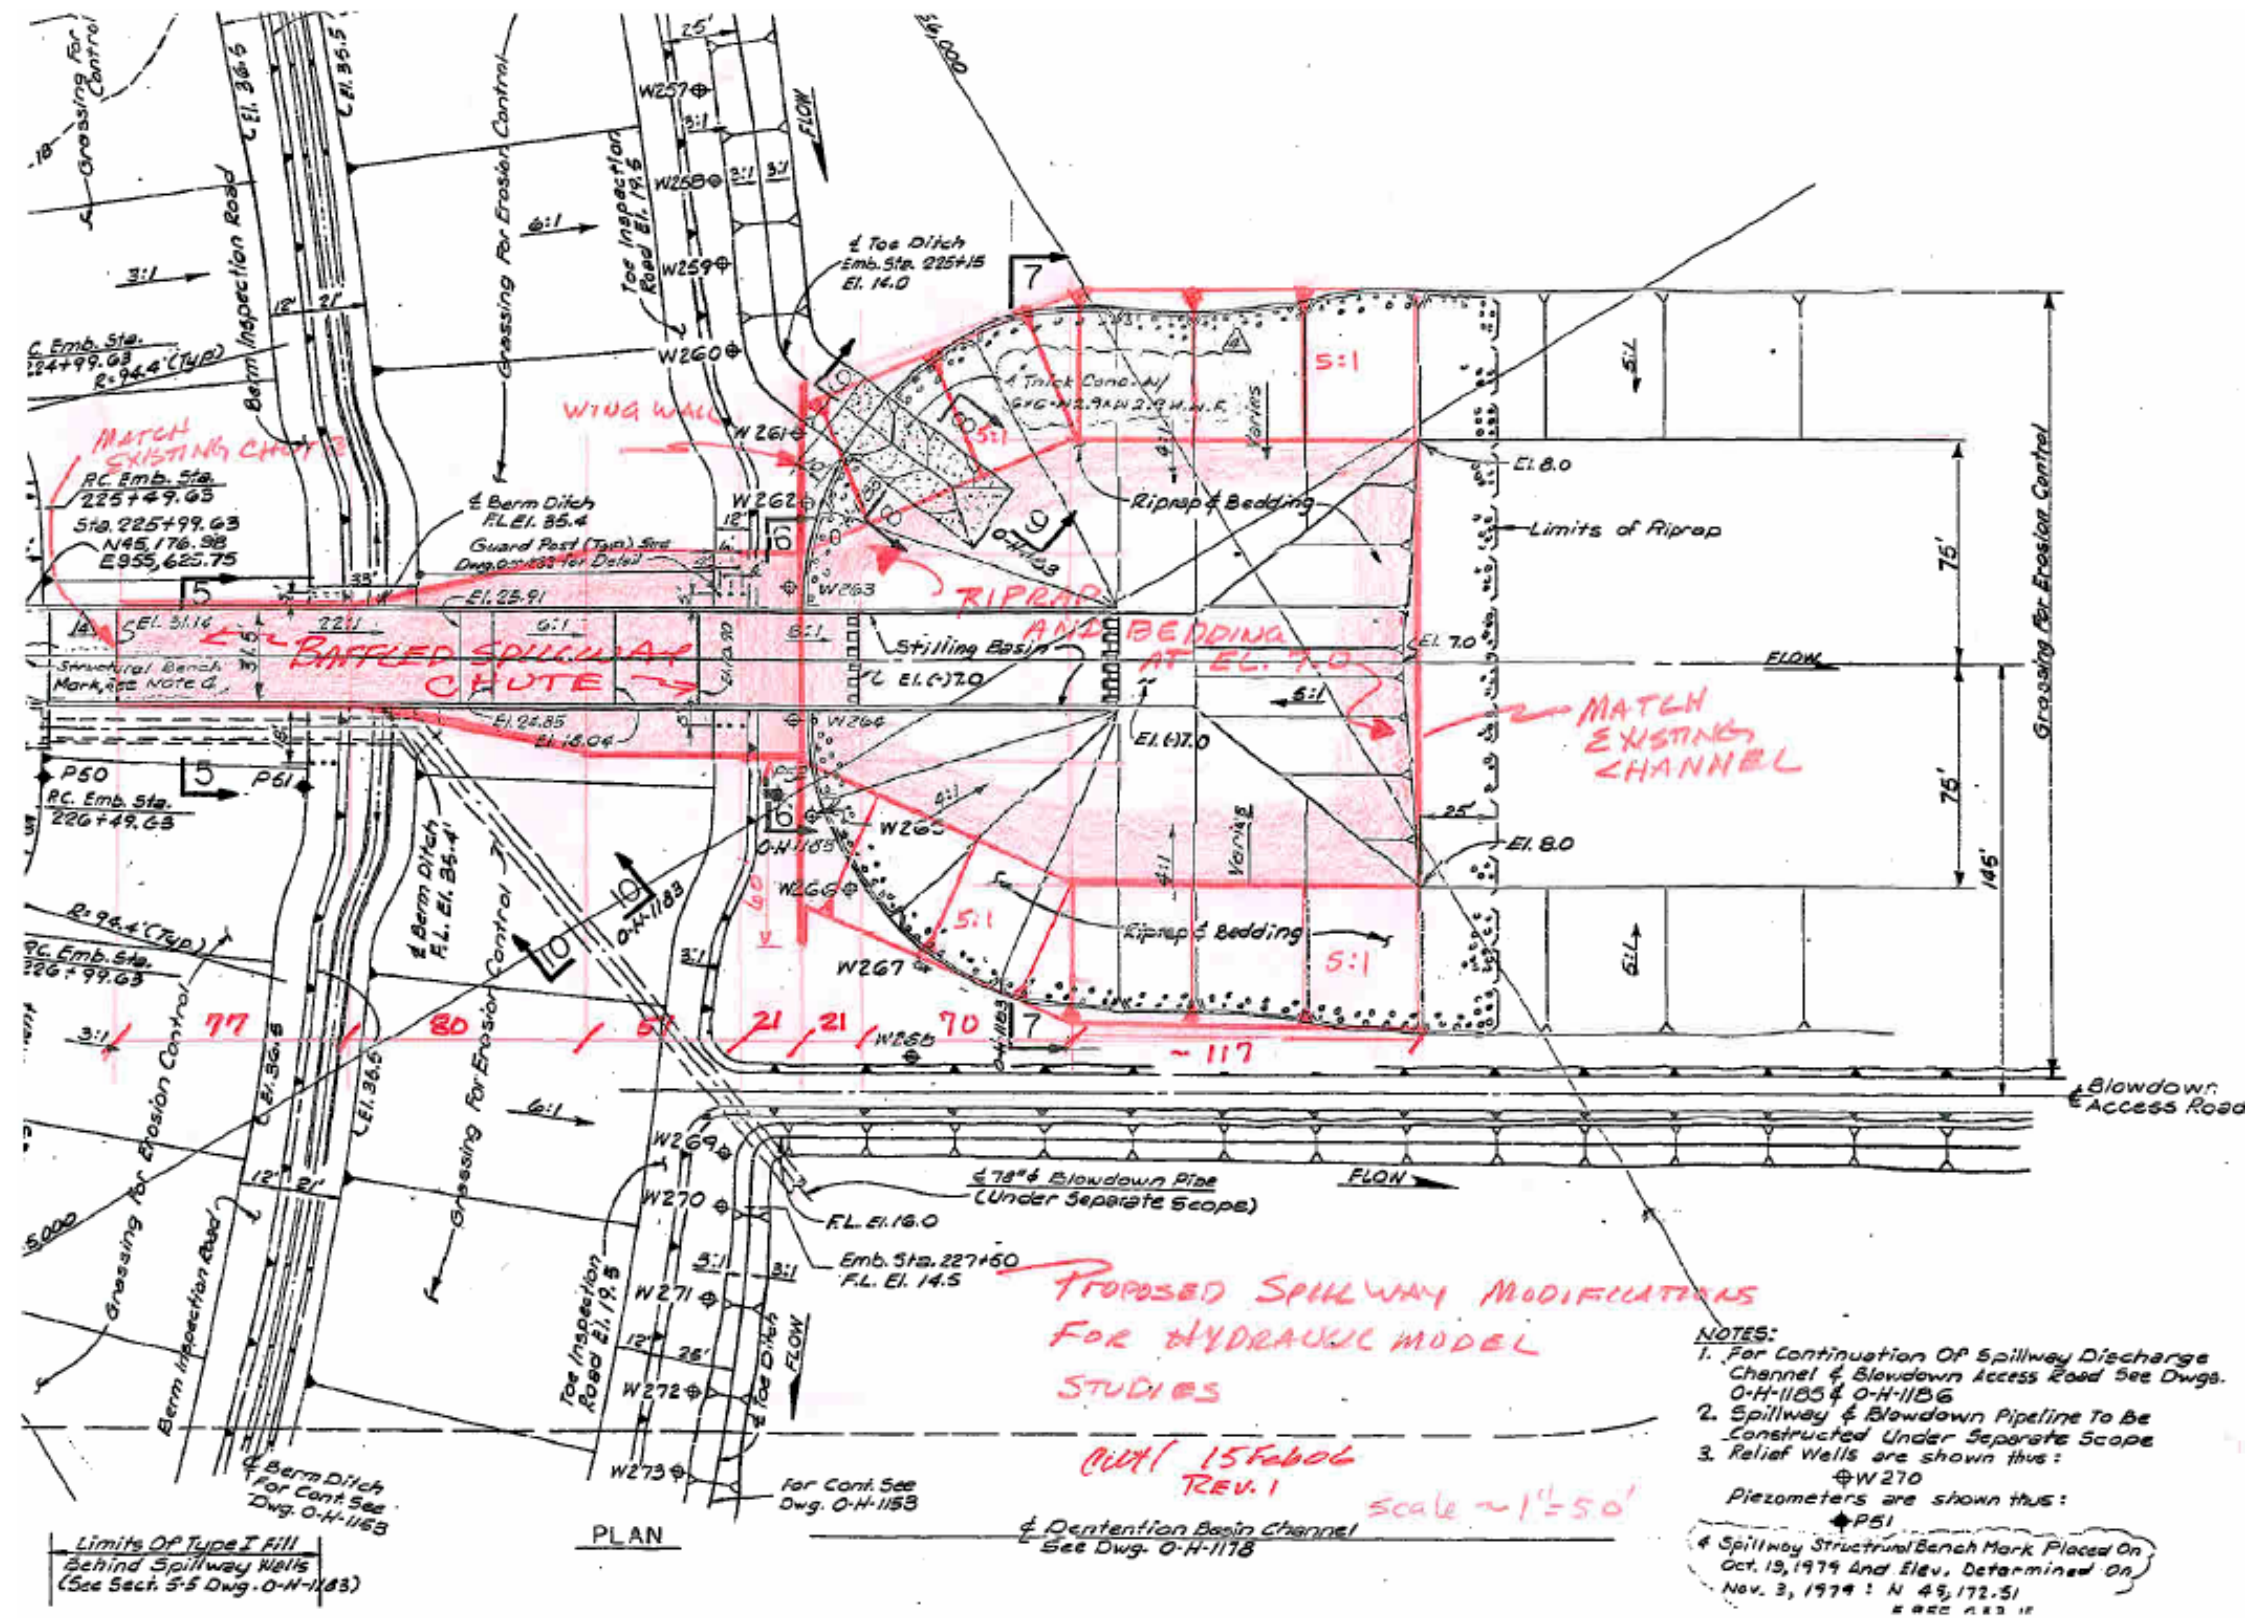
Plan view of the existing prototype reservoir outlet structure with the proposed design in red.
